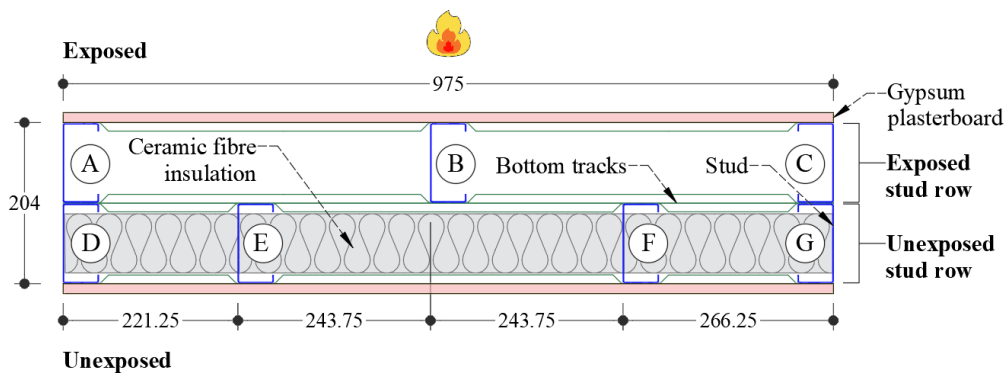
Stud locations in the steel frame and wall components (specimen 4).
